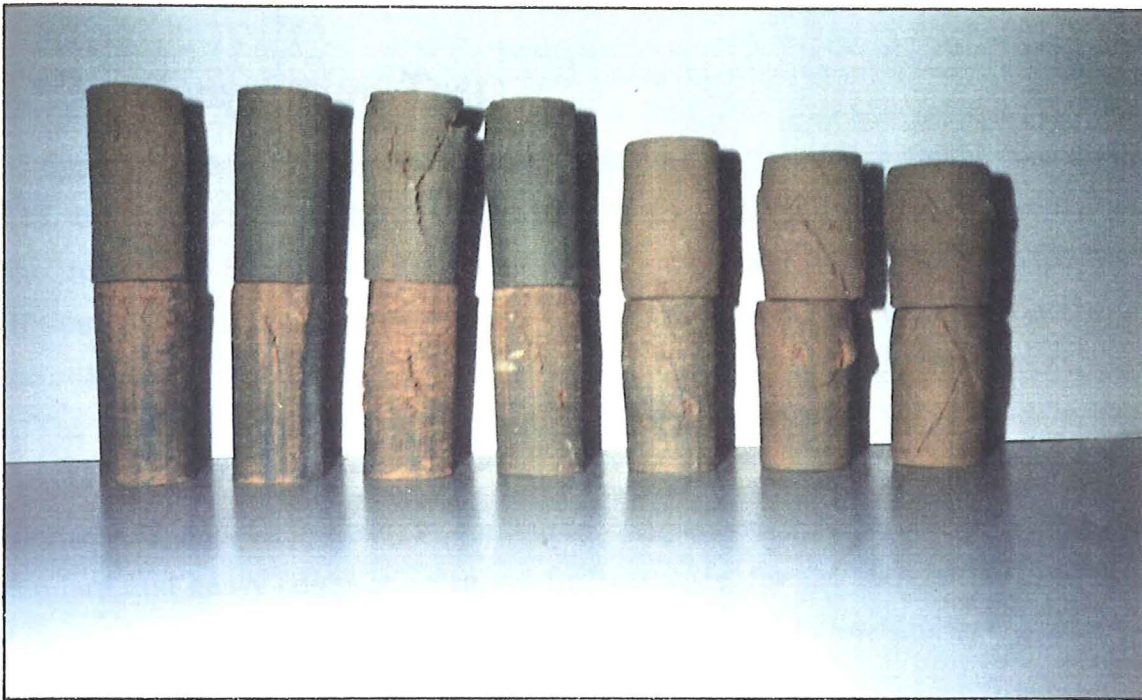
Test Specimen Condition at Failure- remoulded C & P layer
